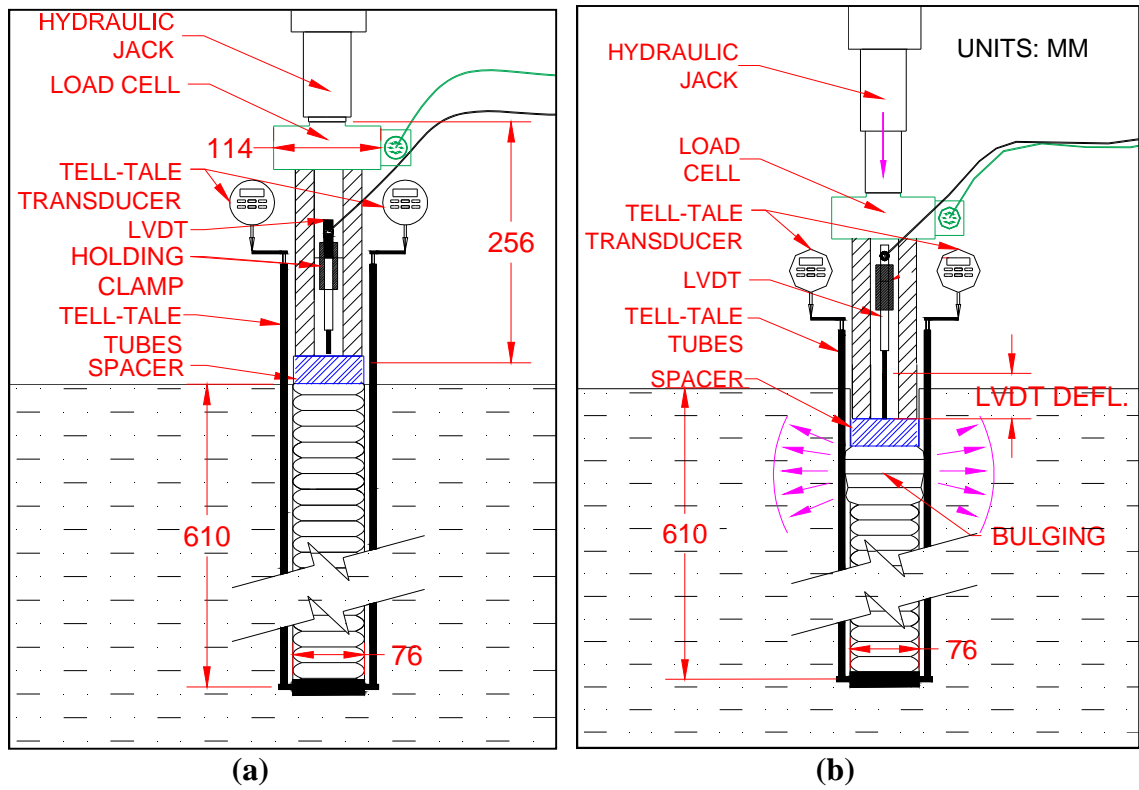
(a) 610 mm pier prior to testing and (b) after bulging failure
